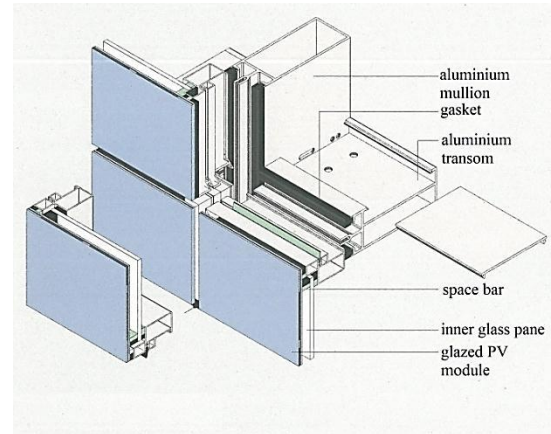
Exploded view of a stick curtain wall with PV module fixed with structural silicone (Robert and Guariento, 2009).
